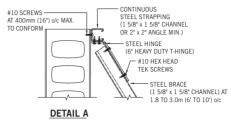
Single Steel Bracing with Strapping on One Side - Top Detail
